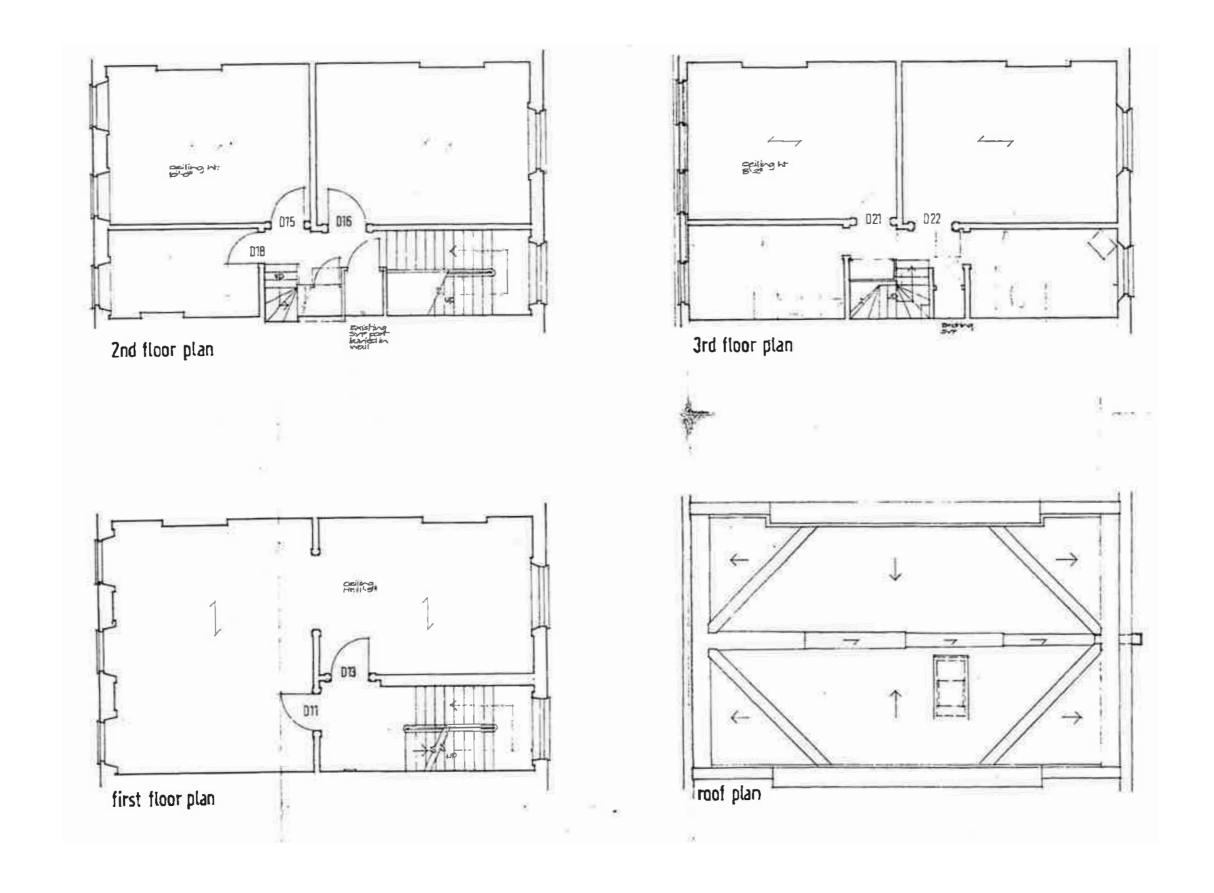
Floor Plans as Existing (1987 Approval following Appeal)
